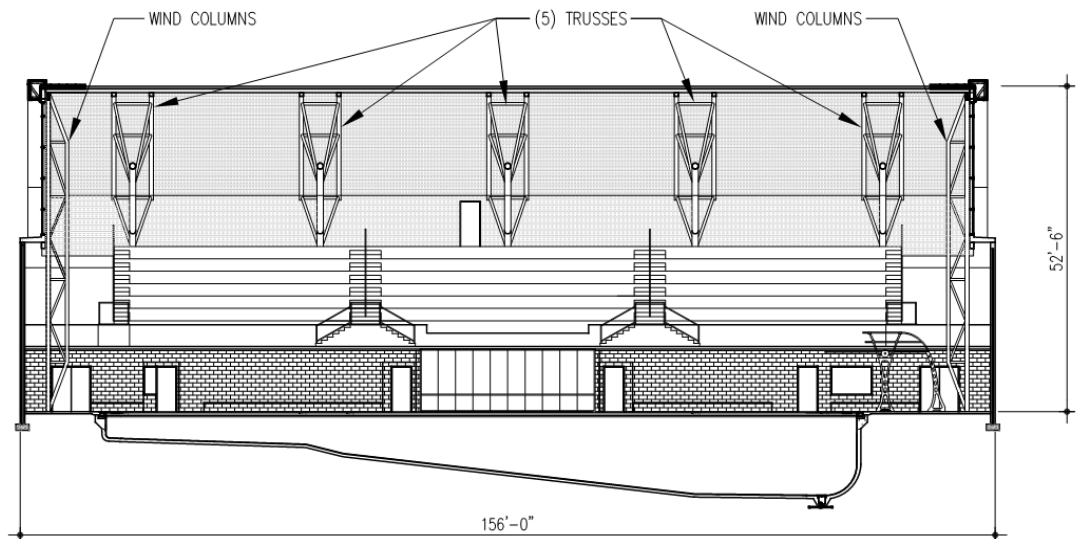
Cross Section Through Indoor Pool Area Showing the Wind Columns (Looking East)
